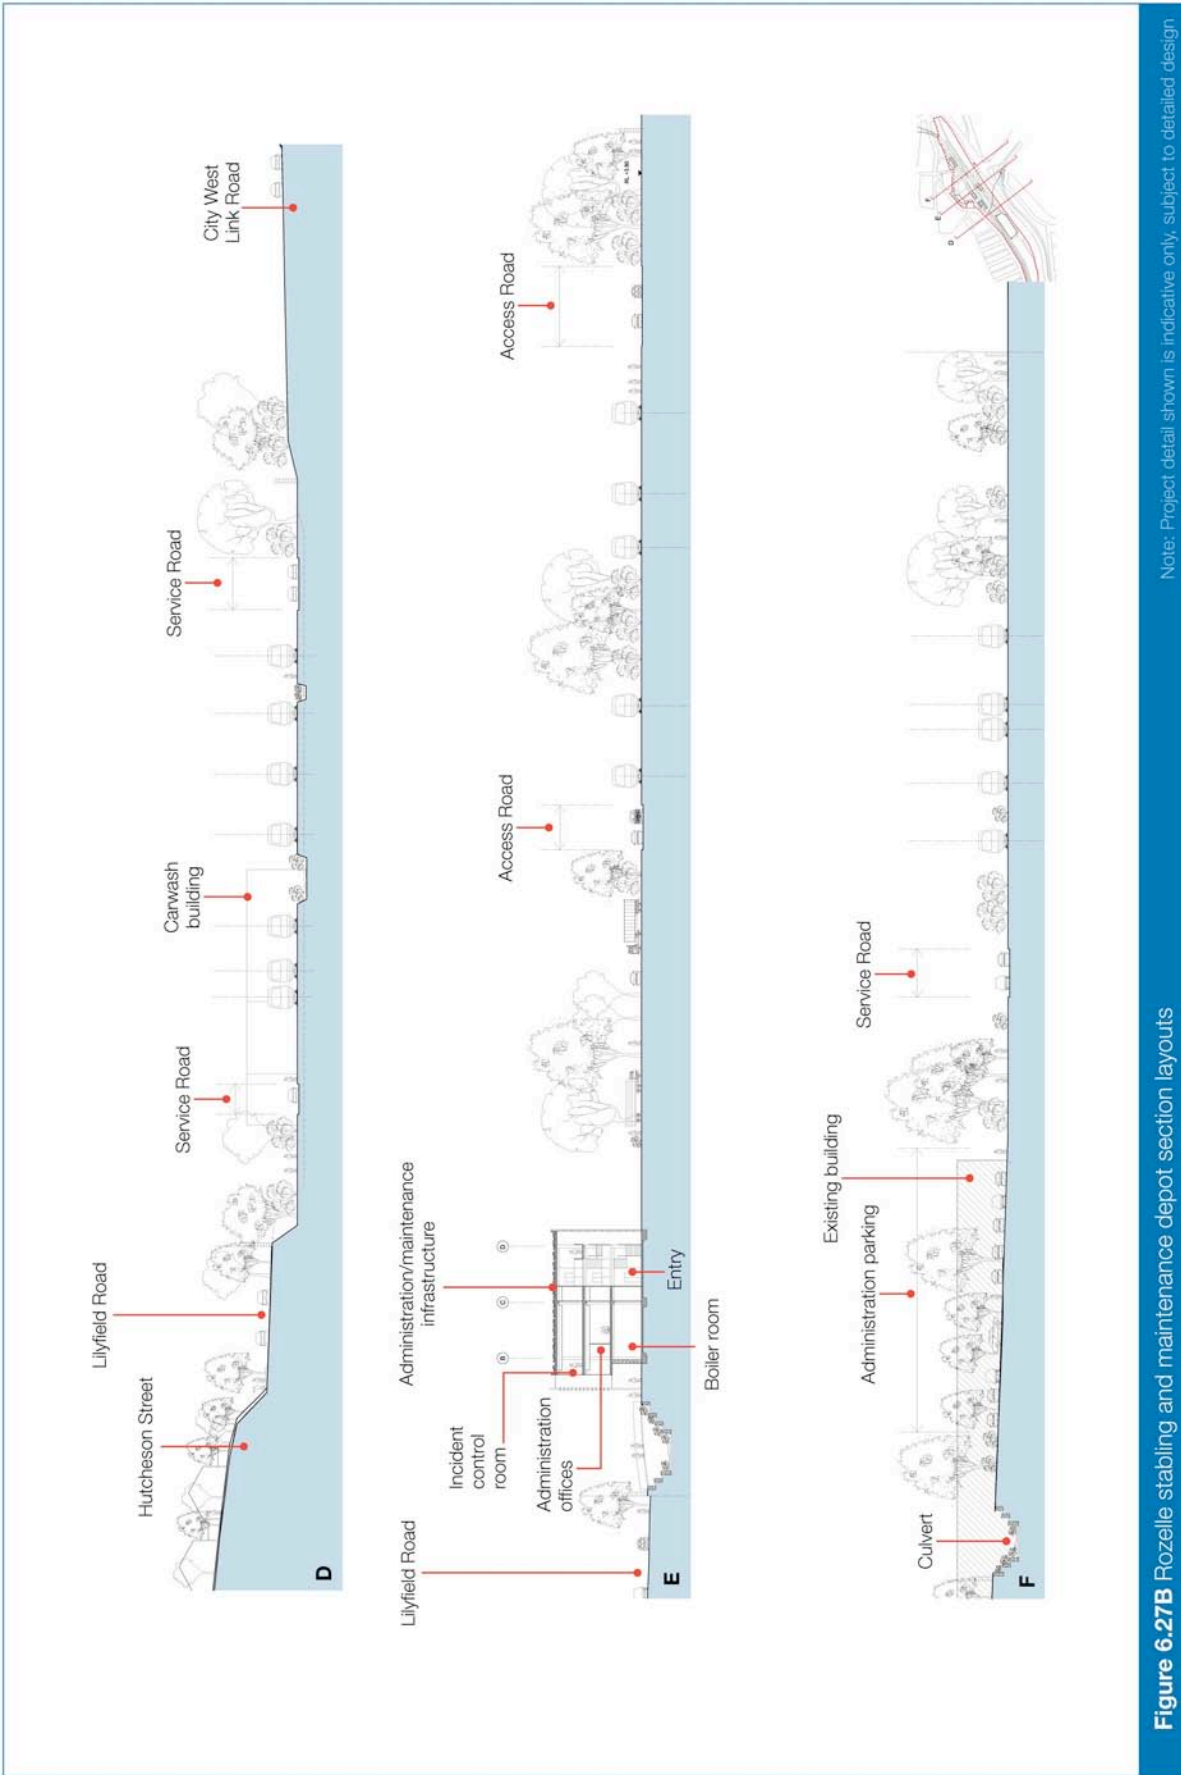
B Rozelle stabling and maintenance depot section layouts
